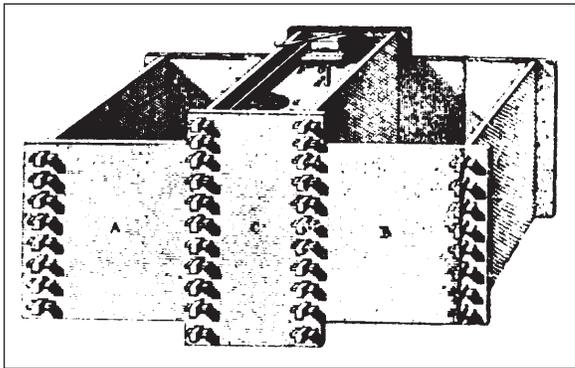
French Caisson. This caisson could be floated over the work site and lowered to the bottom by flooding the side tanks.
